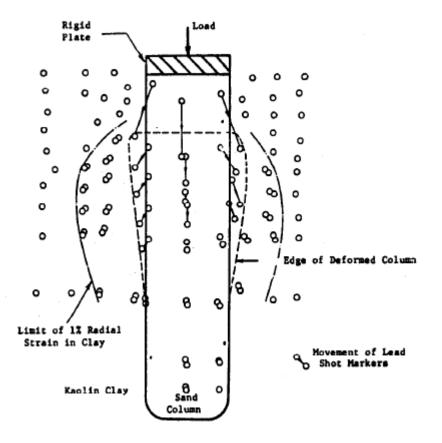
1: The bulging failure of stone column (Hughes & Withers, 1974)
